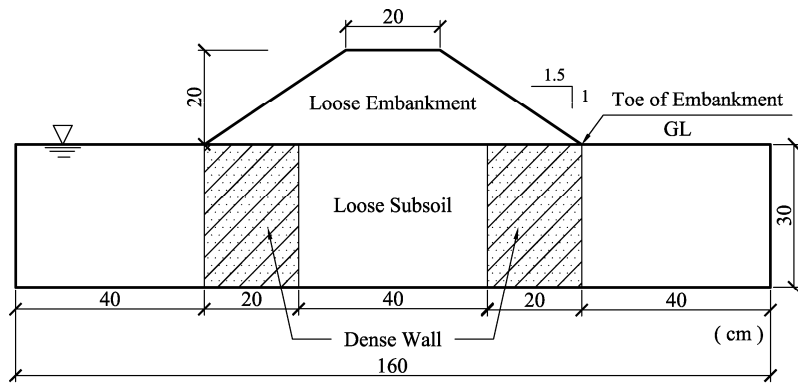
a – Model of loose embankment and loose subsoil fully saturated with 20 cm thick dense sandy wall in subsoil inside of toe of embankment.
